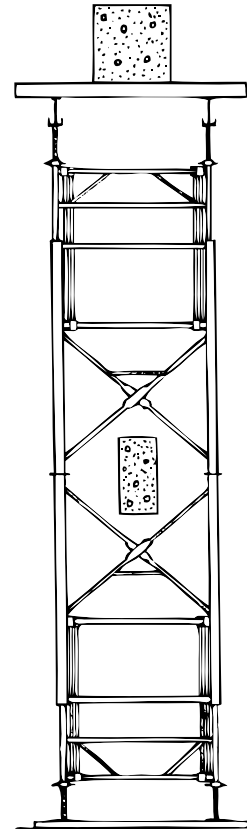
Beam Shoring by straddling intermediate beam. Note that base and extension frames may be inverted.
